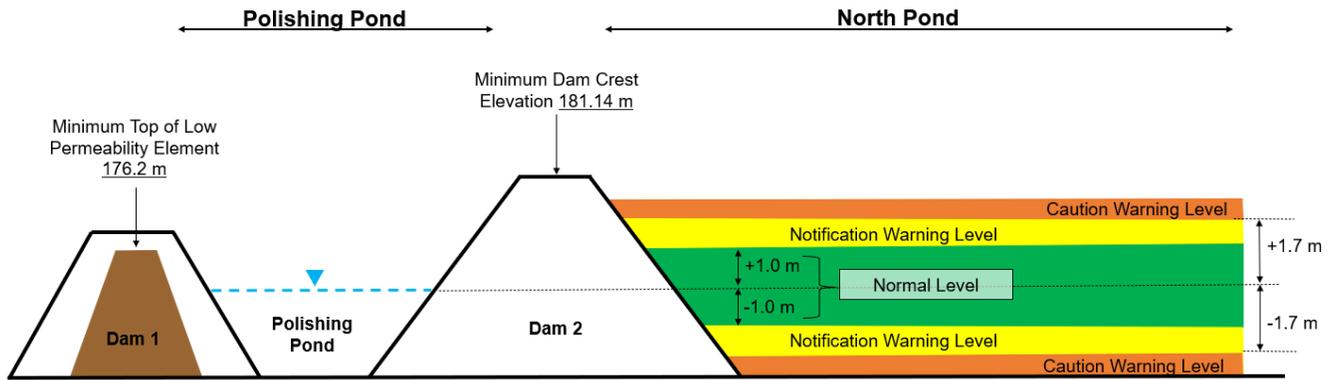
Water and Infrastructure Elevations Dam 2 / North Pond (not to scale)
